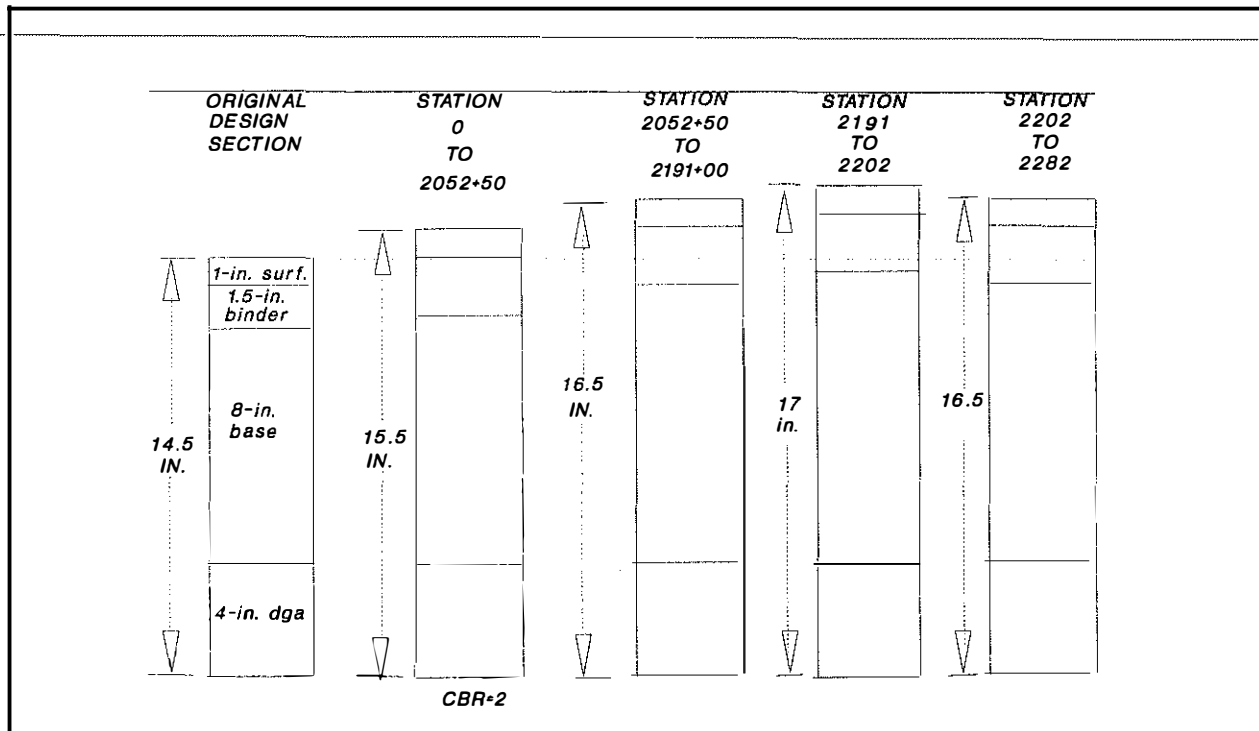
Remedial Overlay Pavement Sections of Sections AA-13 and AA-14.
